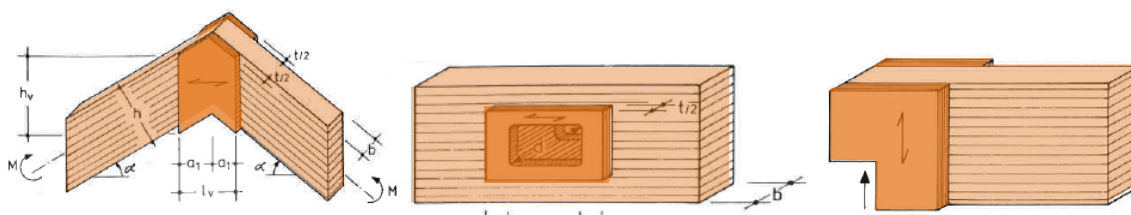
Connection assembled, reinforced end notch or hole (Steck, 1988)
